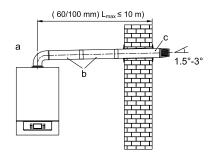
I. Example of flue installation with one 90° bend (Ø60/100 mm)
